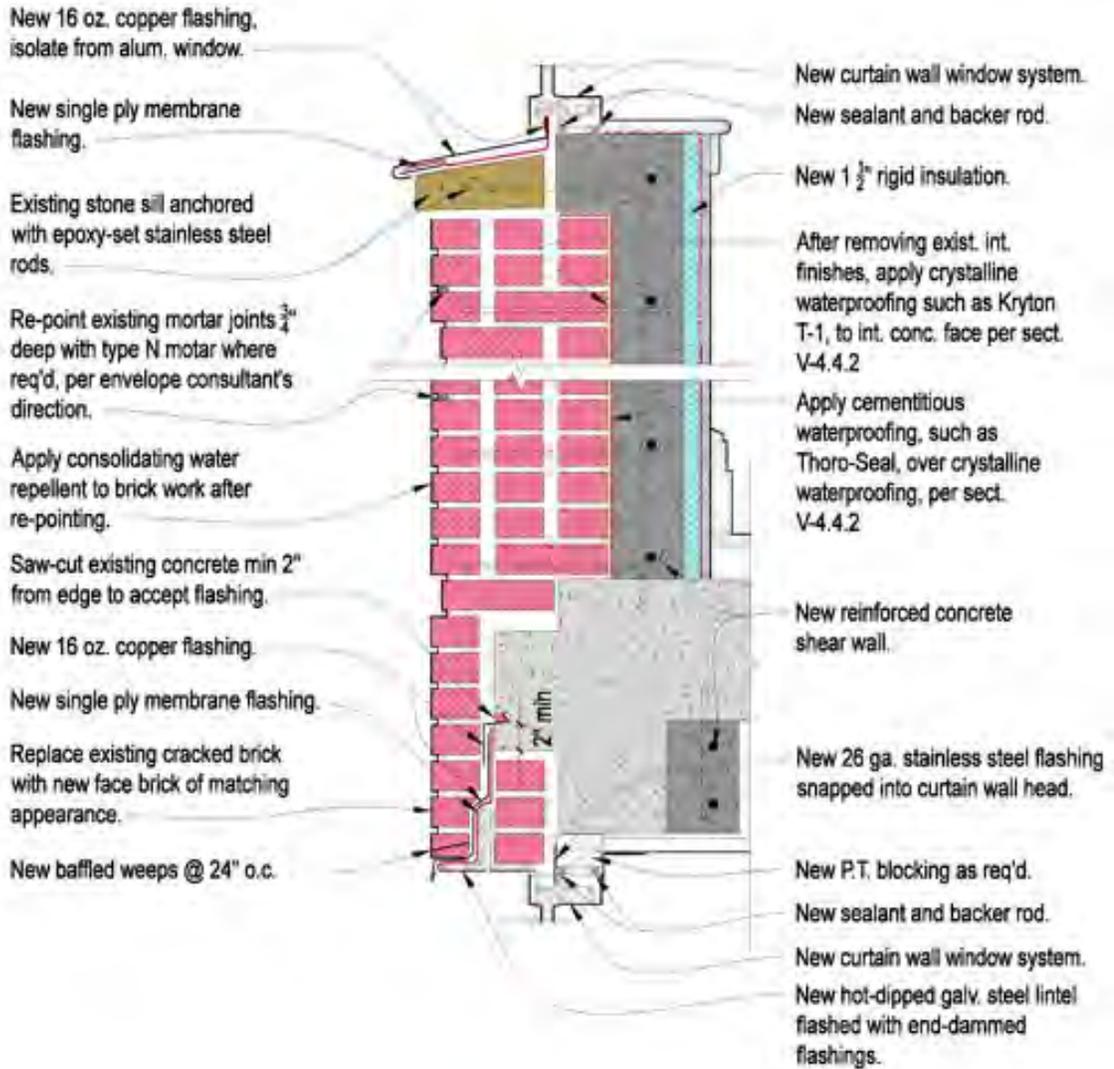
(1): Restoration, Anchorage, and Flashing of Existing Sills
